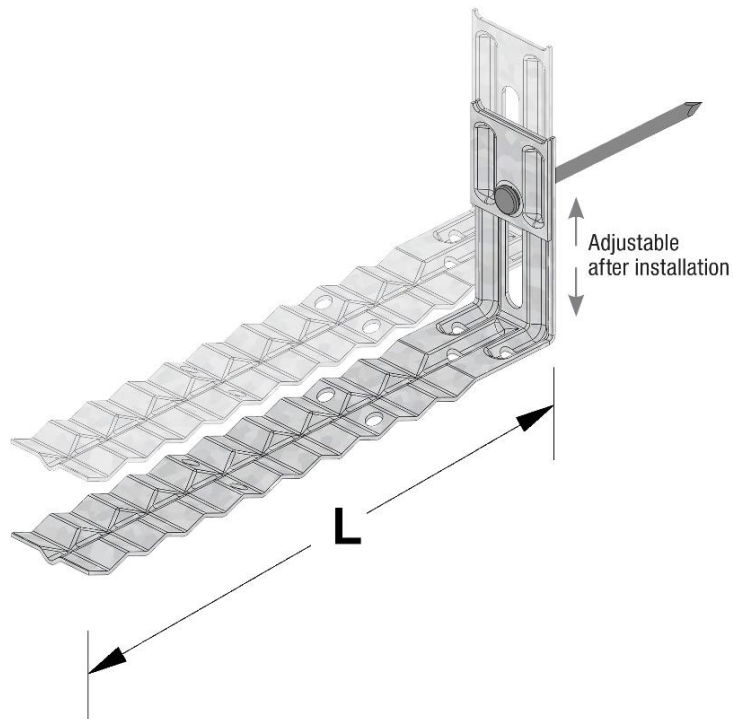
BT BRICK TIE DIMENSIONS AND INSTALLATION
